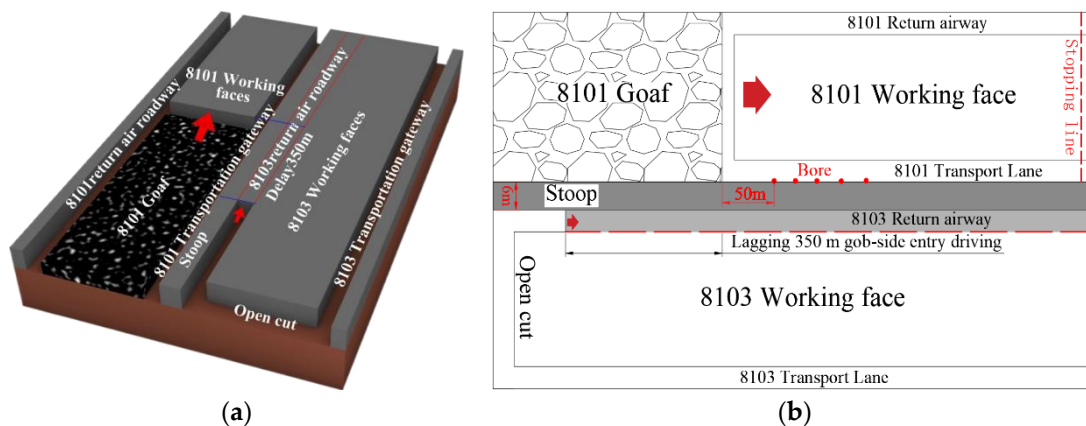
Working face layout. (a) 3D diagram. (b) Floor plan.
